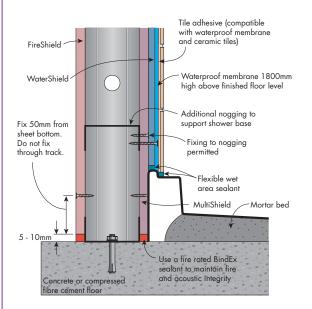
Wall Base in Shower Area Preformed external shower tray – Single layer
